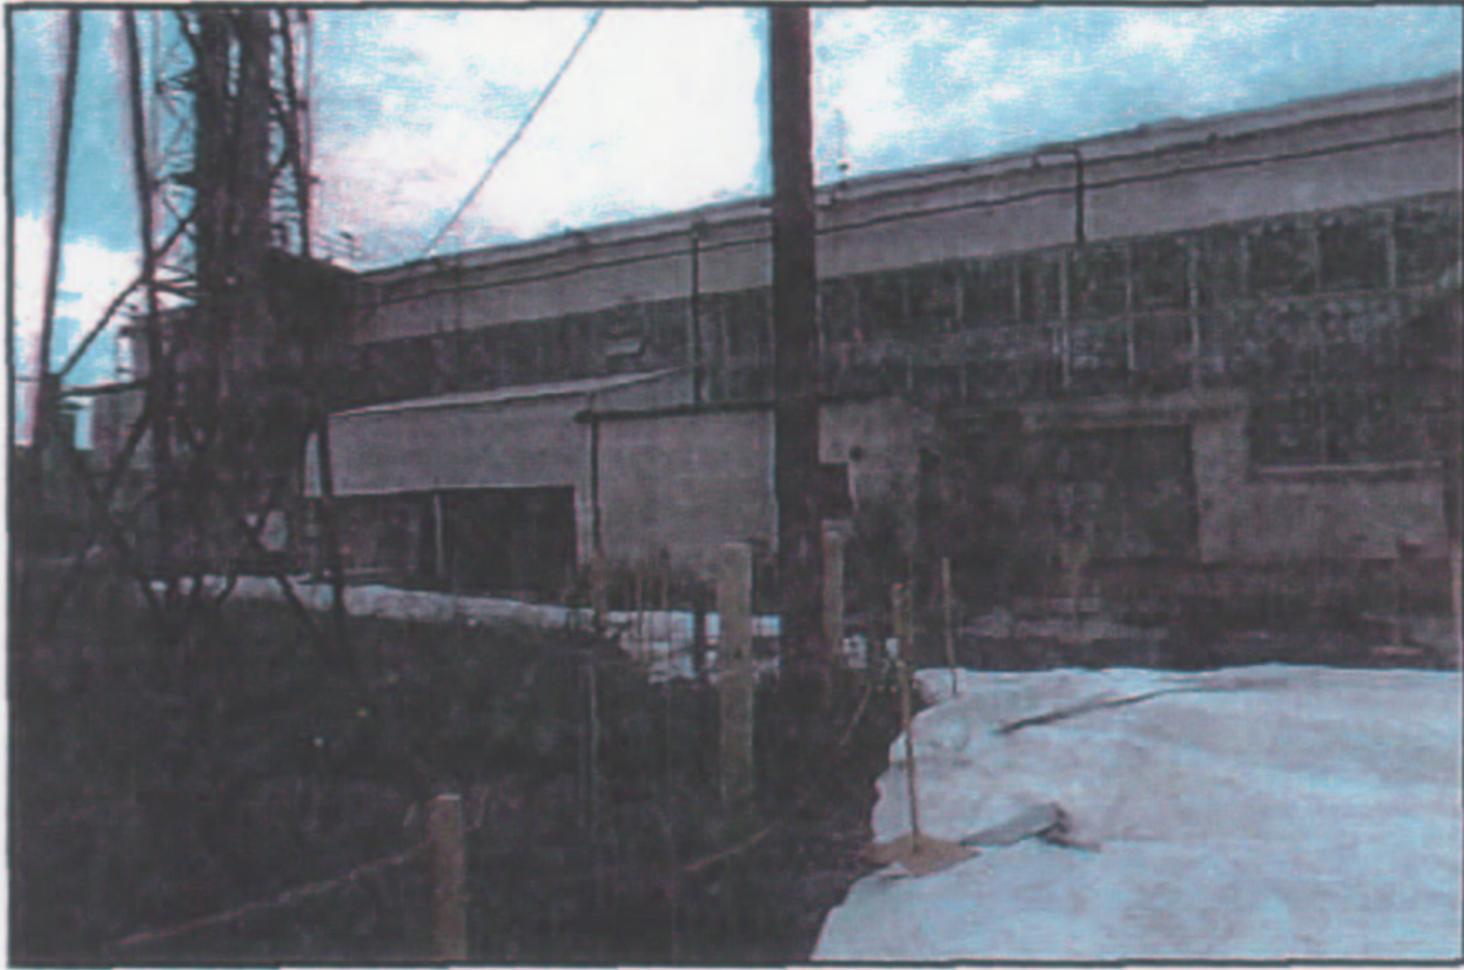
North facade of C-410 showing its original window wall and concrete block refrigeration wing.
